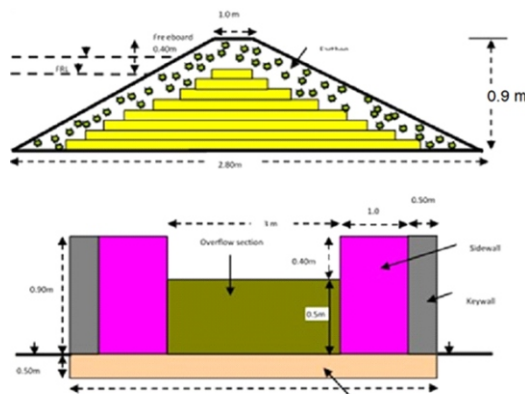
Cross-sectional and longitudinal Sections of a sample Bori-bund (sand bag gully plug)
